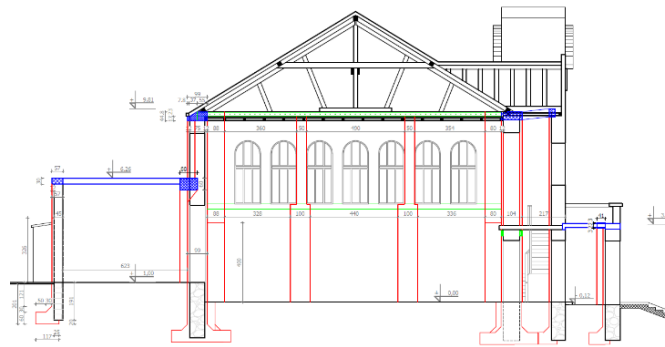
Characteristic cross sections for the proposed strengthening solution: transverse cross section
